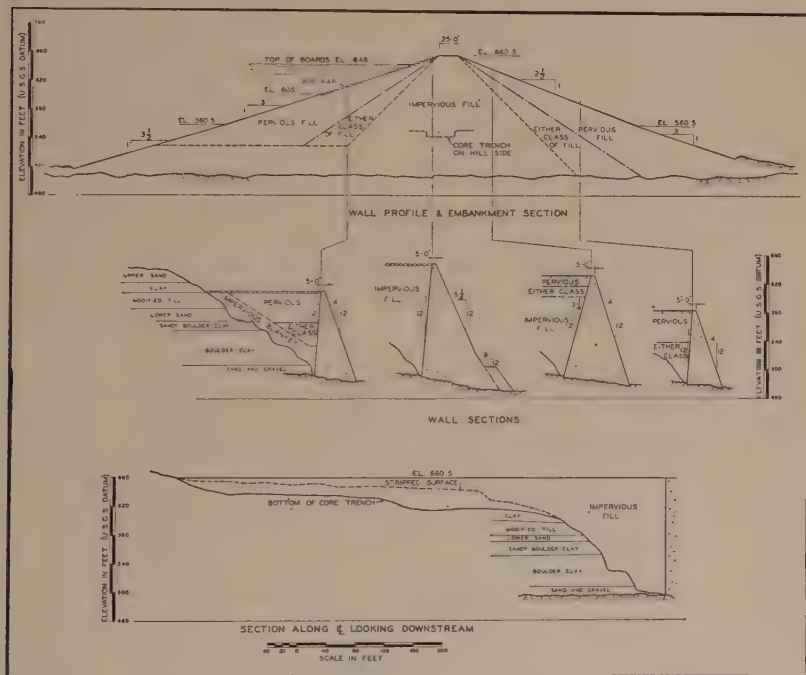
EAST EMBANKMENT AND RETAINING WALL
